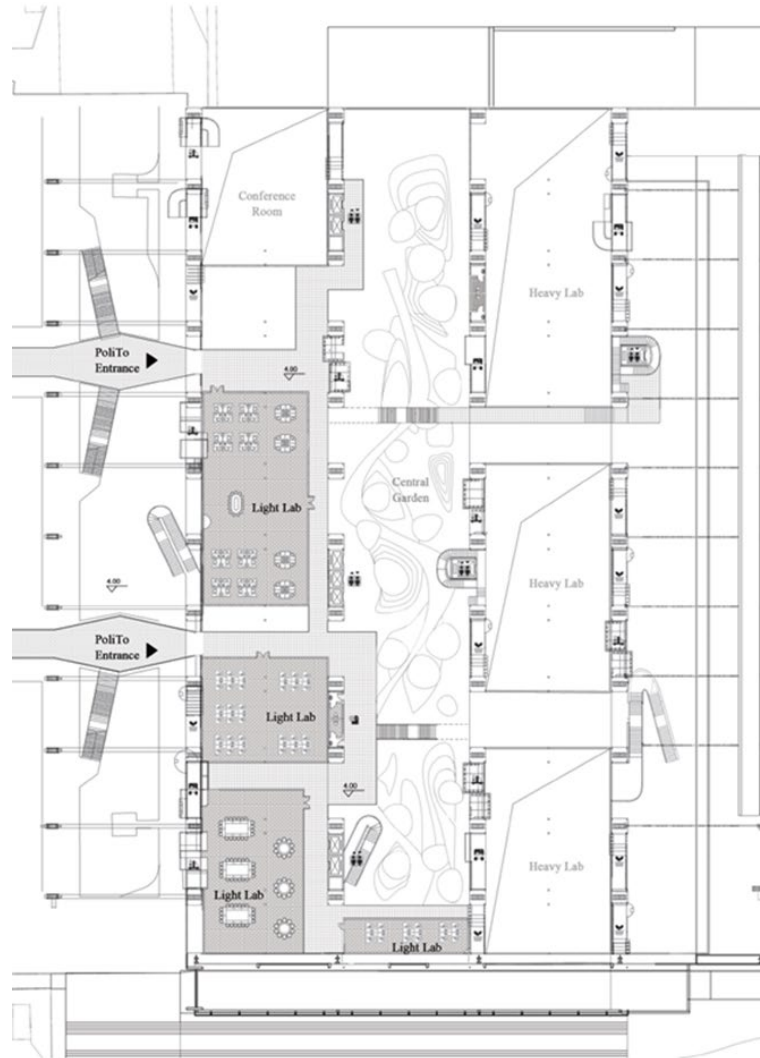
Second-Floor Space Coordinated with the Ground Floor and Connecting Existing Buildings
